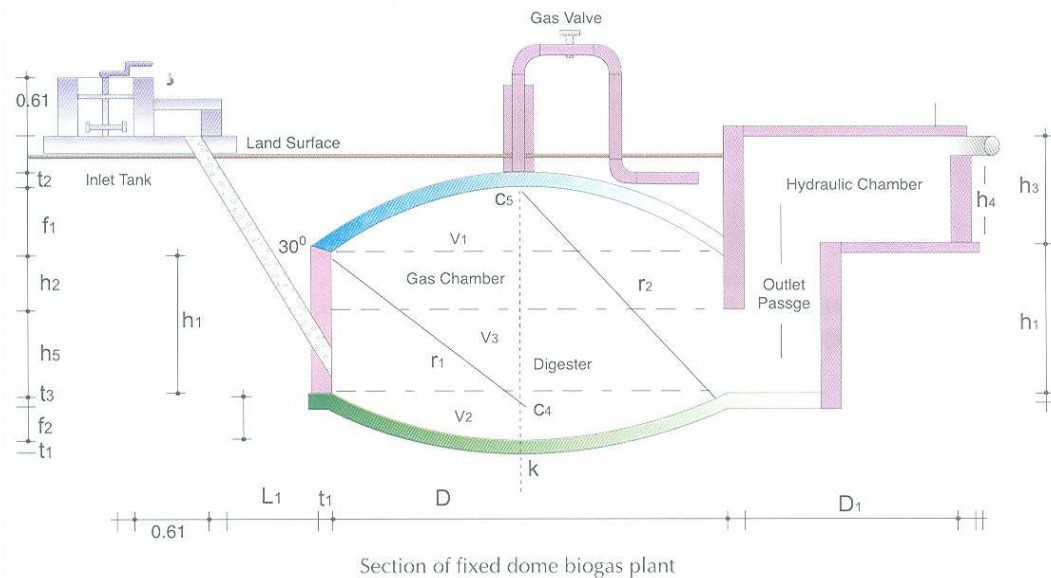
GS' fixed dome biogas plant layout (Islam 2007)
